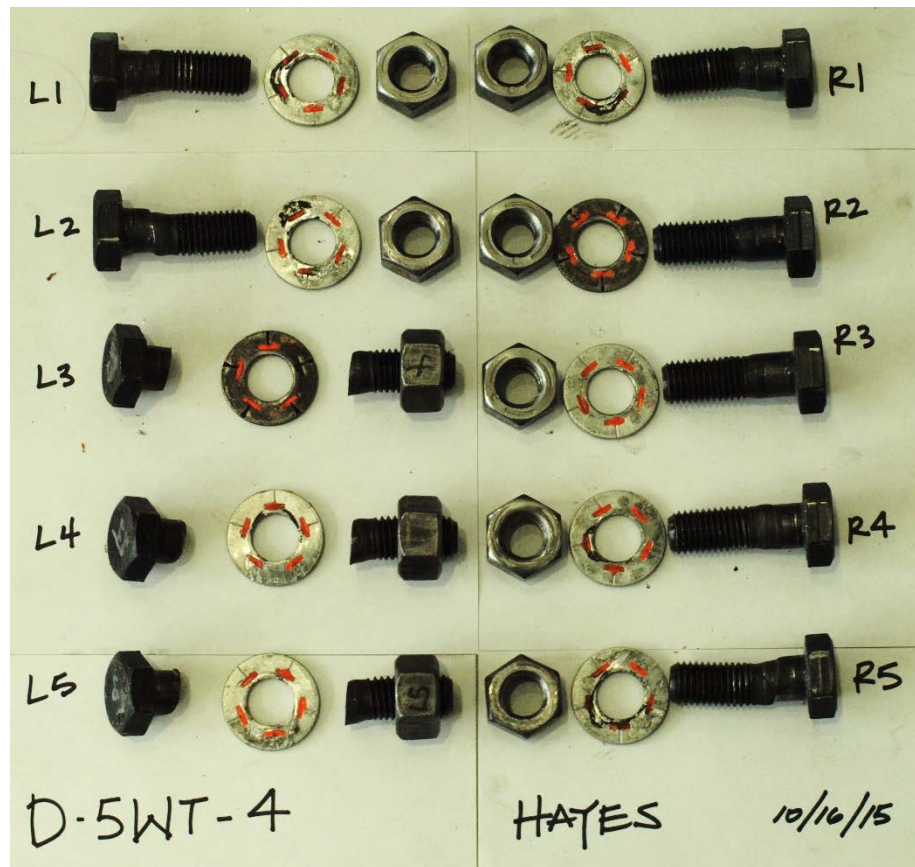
D5WT4 Bolts after Testing.
